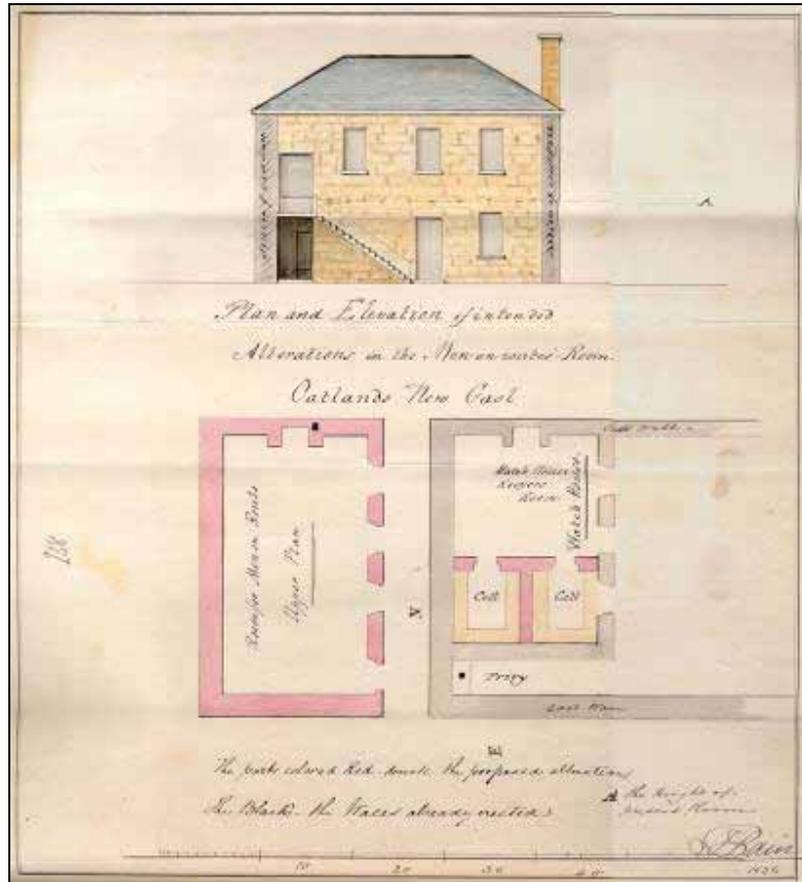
The 1836 plans for conversion of the partially completed Javelin Men's Building into a Watch-House. The grey walls show what was already built in mid-1836, with the red walls proposed to be added (AOT CSO 1/691/15206:137).
